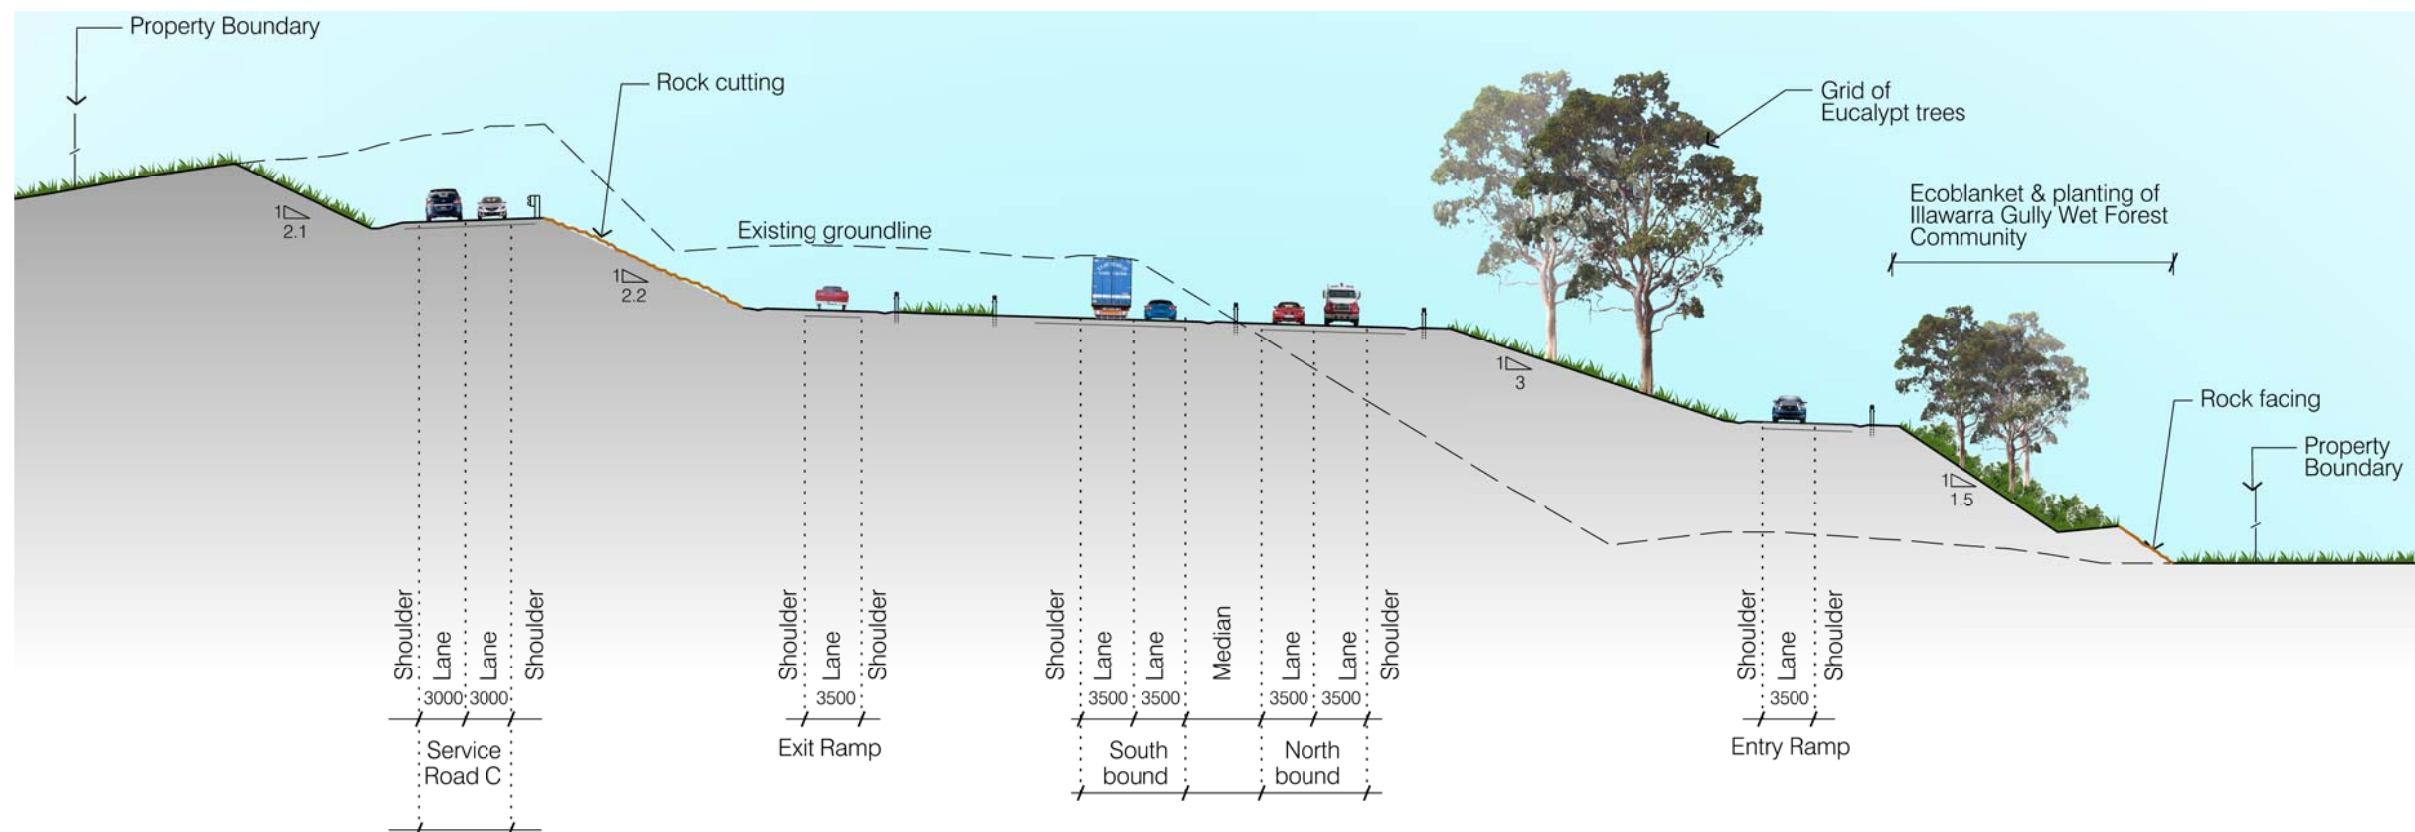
Road cross section at Ch. 15650 (Scale 1:500 @ A3)
